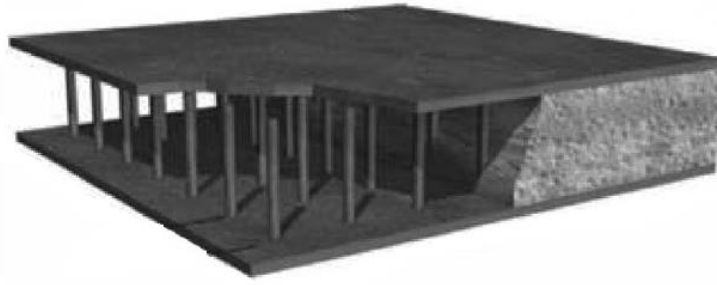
Steel concrete steel panel, Figure from Liew and Wang (2011).
